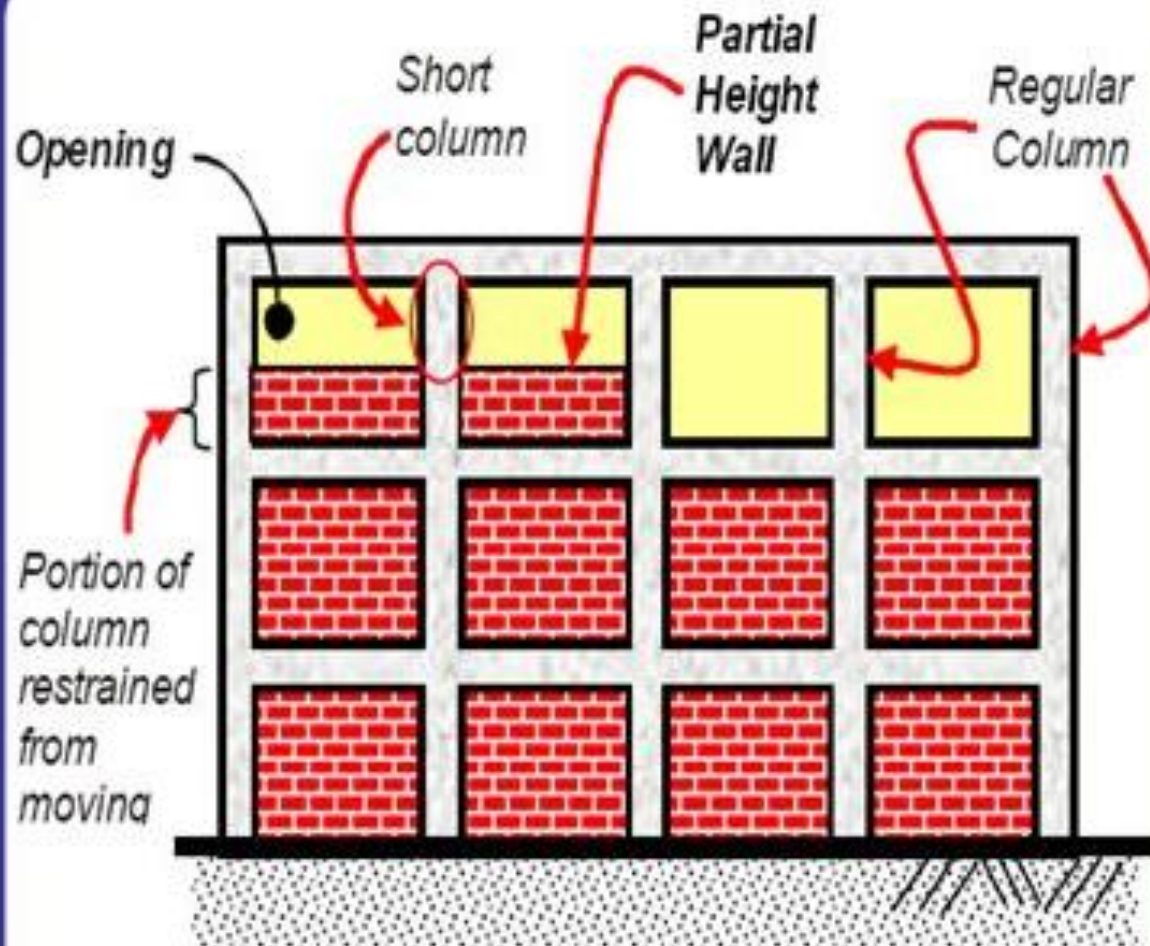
Short columns effect in RC buildings when partial height walls adjoin columns – *the effect is implicit here because infill walls are often treated as non-structural elements.
